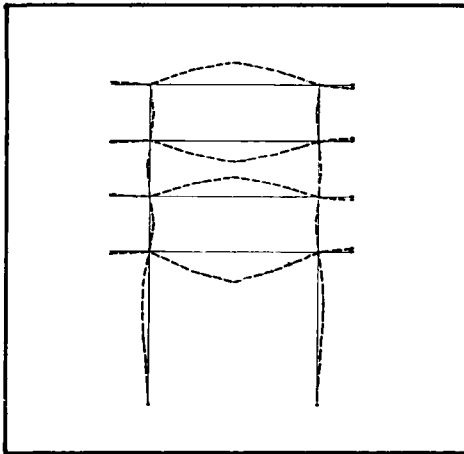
Structural Lab Building - Mode 6 (6.4Hz).
